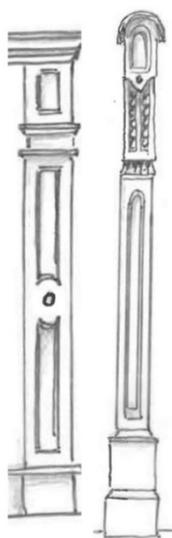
Examples of panelled, plain and fluted pilasters with decorative consoles/corbels
